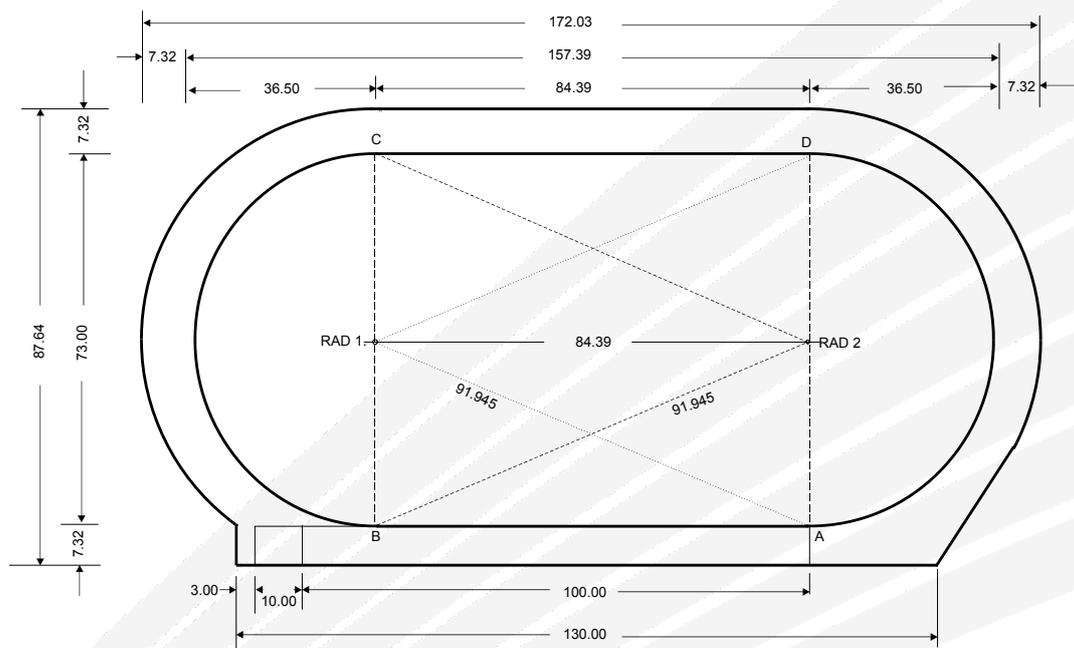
Standard dimensions for 400-metre, six-lane track (radius 36.5m)
